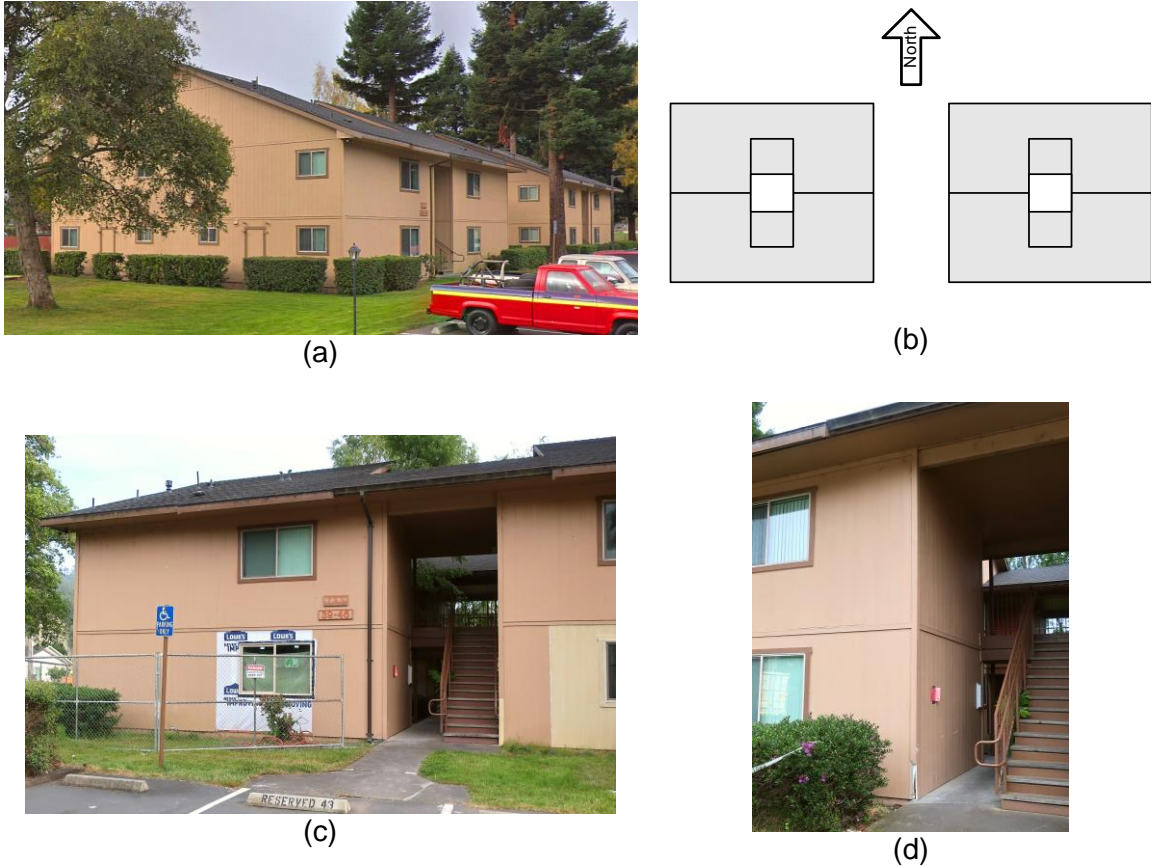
Damaged apartment buildings (built in 1992). Photos taken in May 2023 during repairs. (a) View prior to earthquakes (undated Google maps street view image). There are two identical buildings each having eight apartment units (second building is in background to the right). Both buildings suffered damage. (b) Building plan views. (c) Building undergoing replacement of window and siding. (d) Damage to fiber-cement siding at corner of building at base (photo center).
